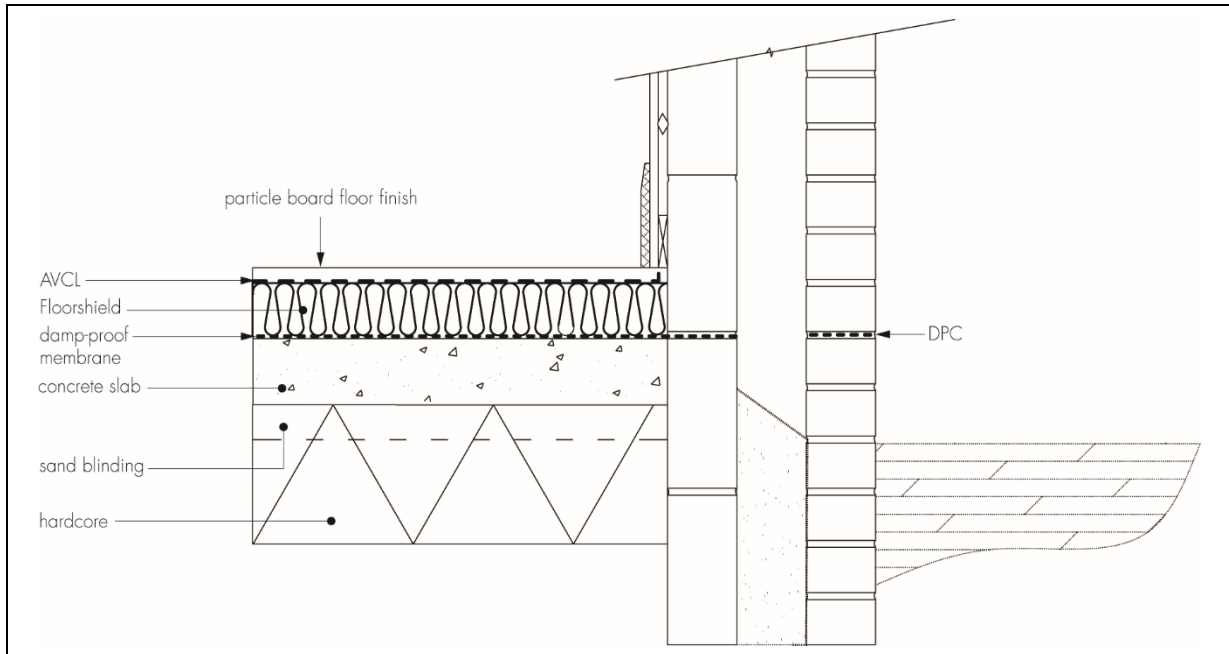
Typical installation details – particle board (DPM over concrete slab)
